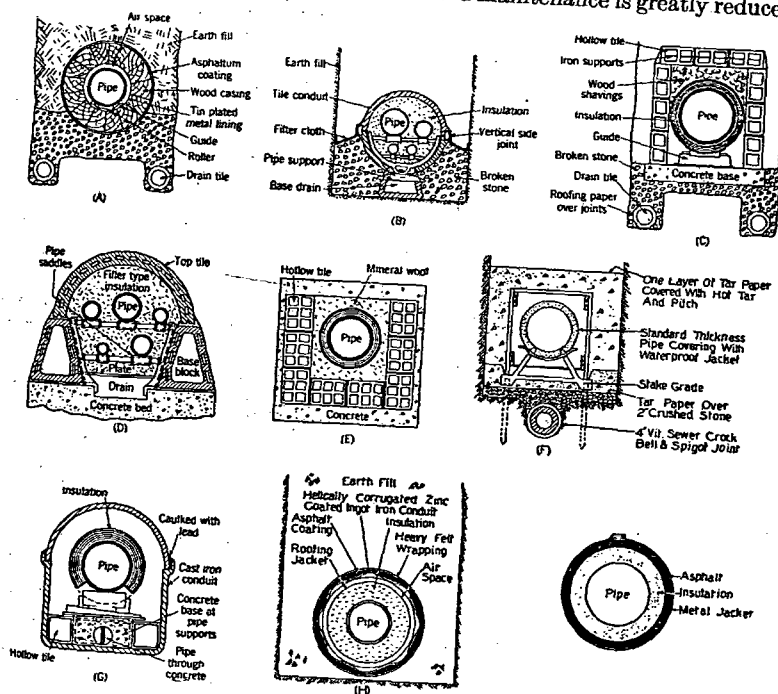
CONSTRUCTION DETAILS OF CONDUITS COMMONLY USED
